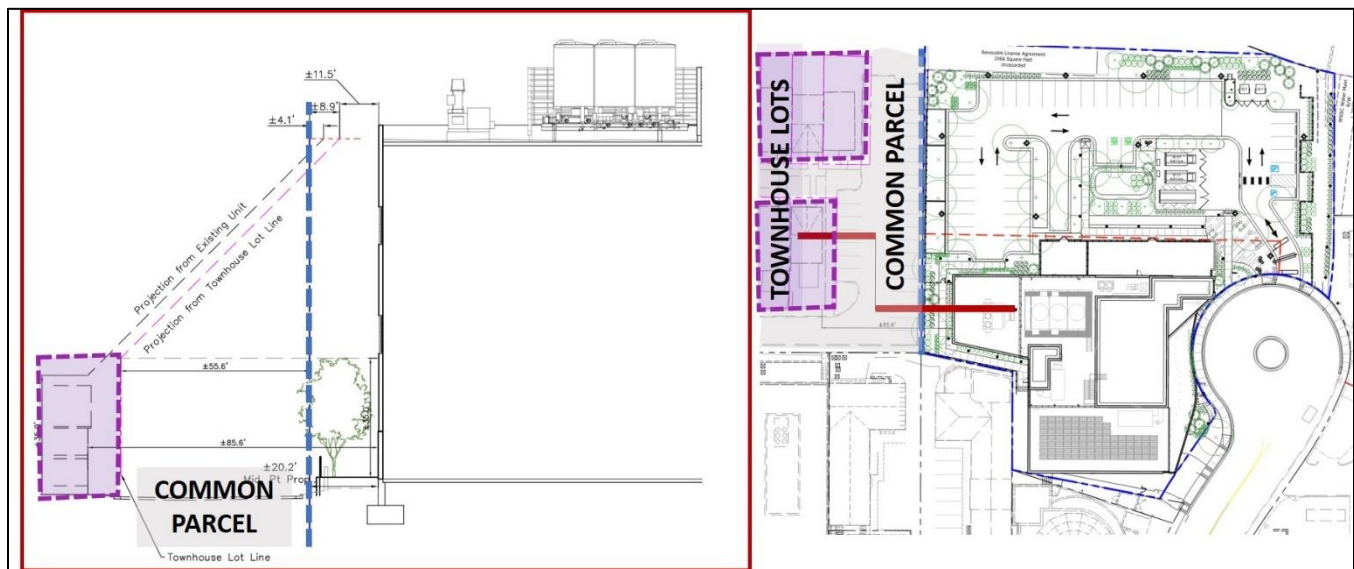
Diagram showing proposed building height with adjacent townhouse development
